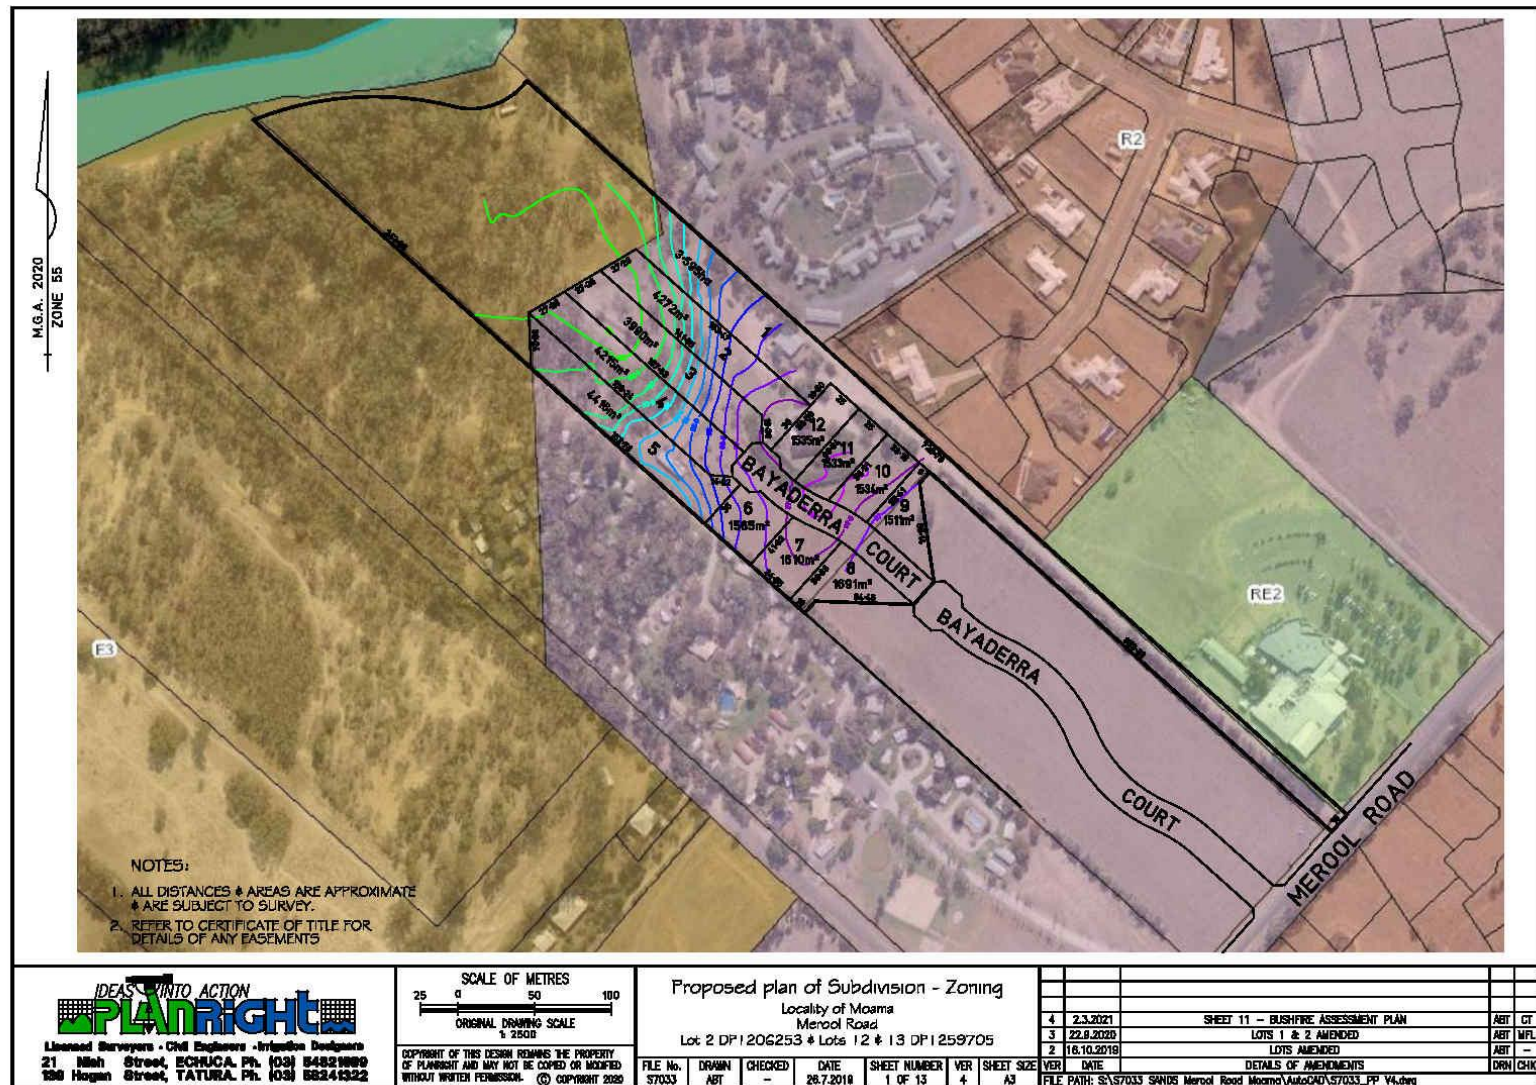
Plan of Subdivision, 66 Merool Street, Moama (Planright Echuca, dated 26/7/19).
